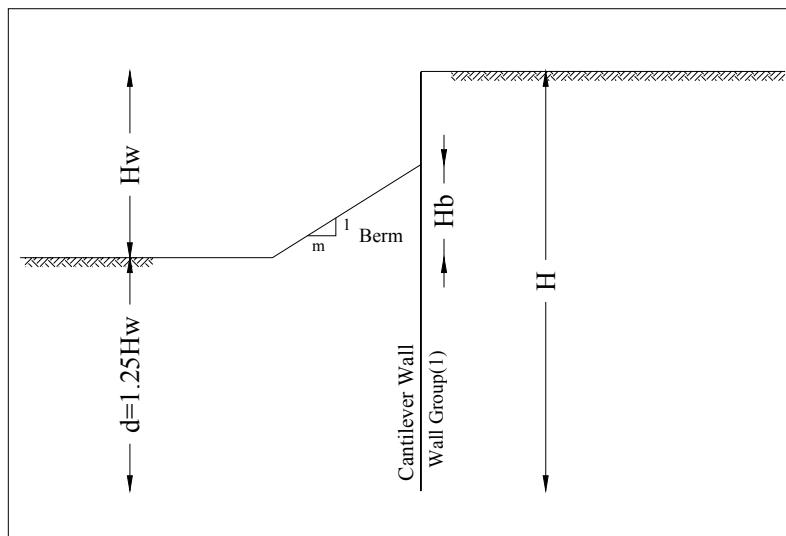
Geometry of Bermed Wall with Zero Top Width
